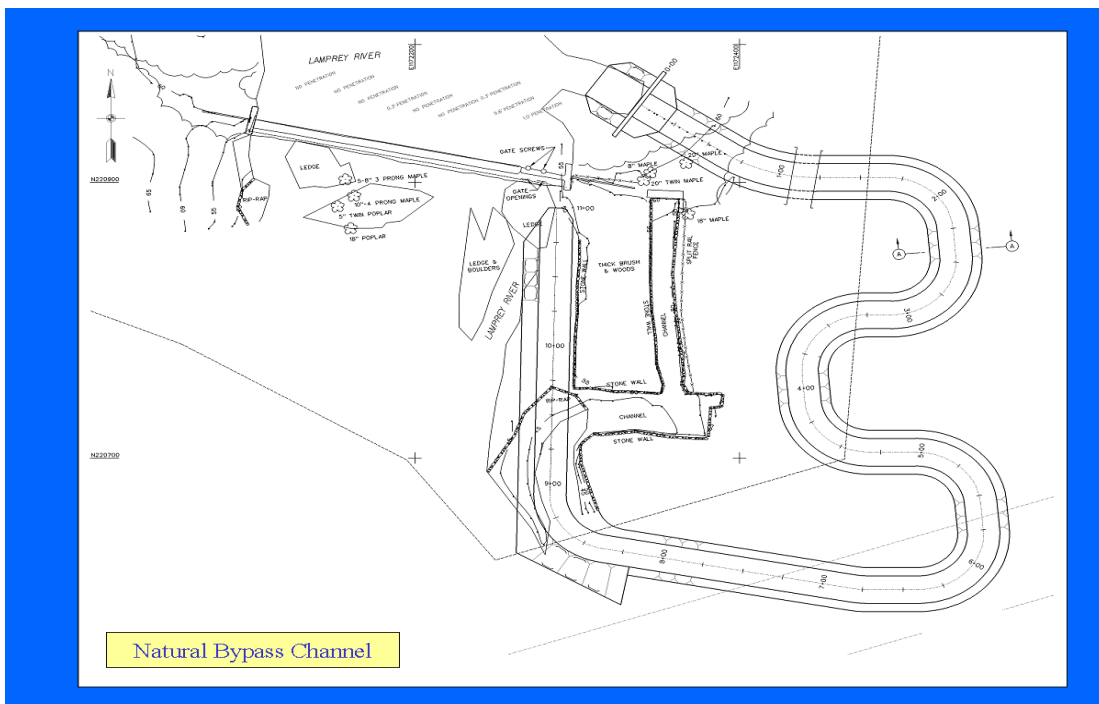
Preliminary Layout of River-Like Fishway at Wiswall Dam
